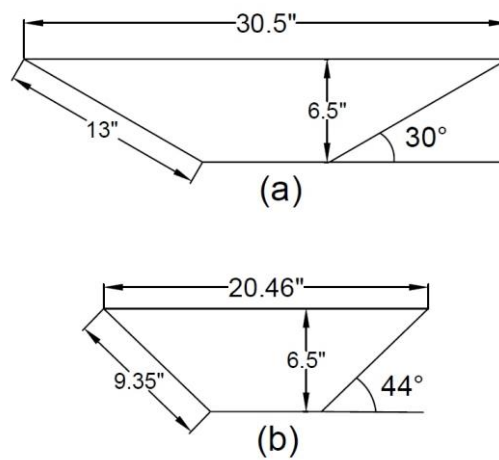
(a) Longitudinal cross section; (b) Transverse cross section
